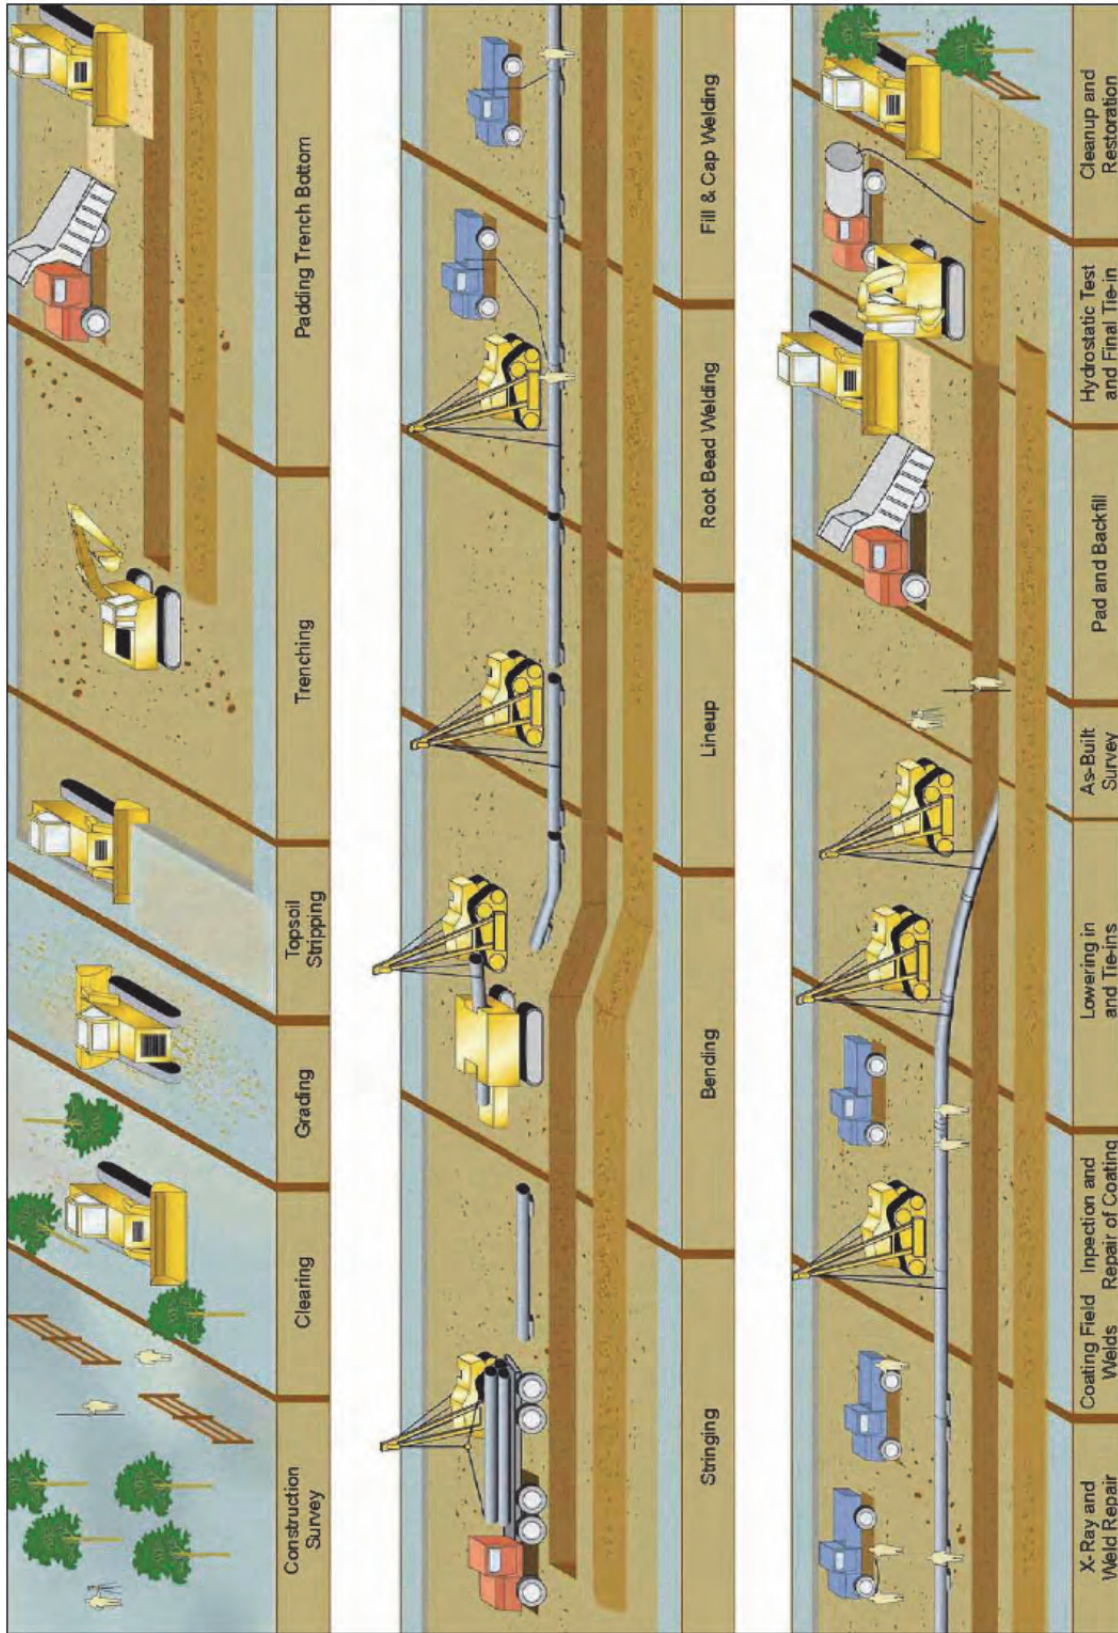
Typical Pipeline Construction Approach (Enterprise 2013a.)
